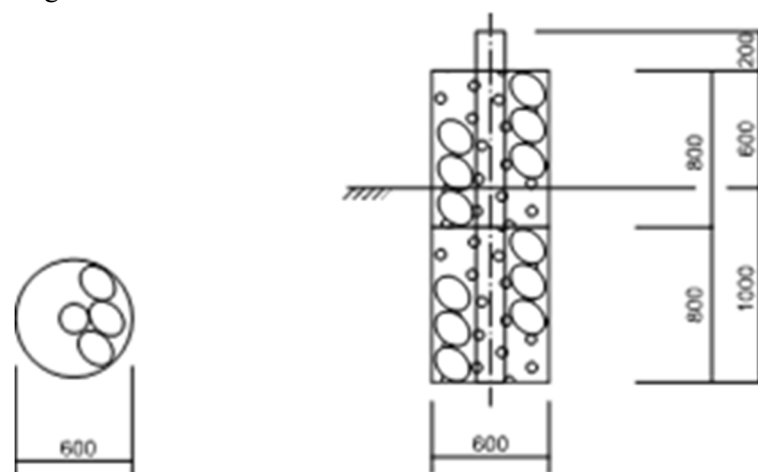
Structural Drawing of Vertical Degassing Pipes
